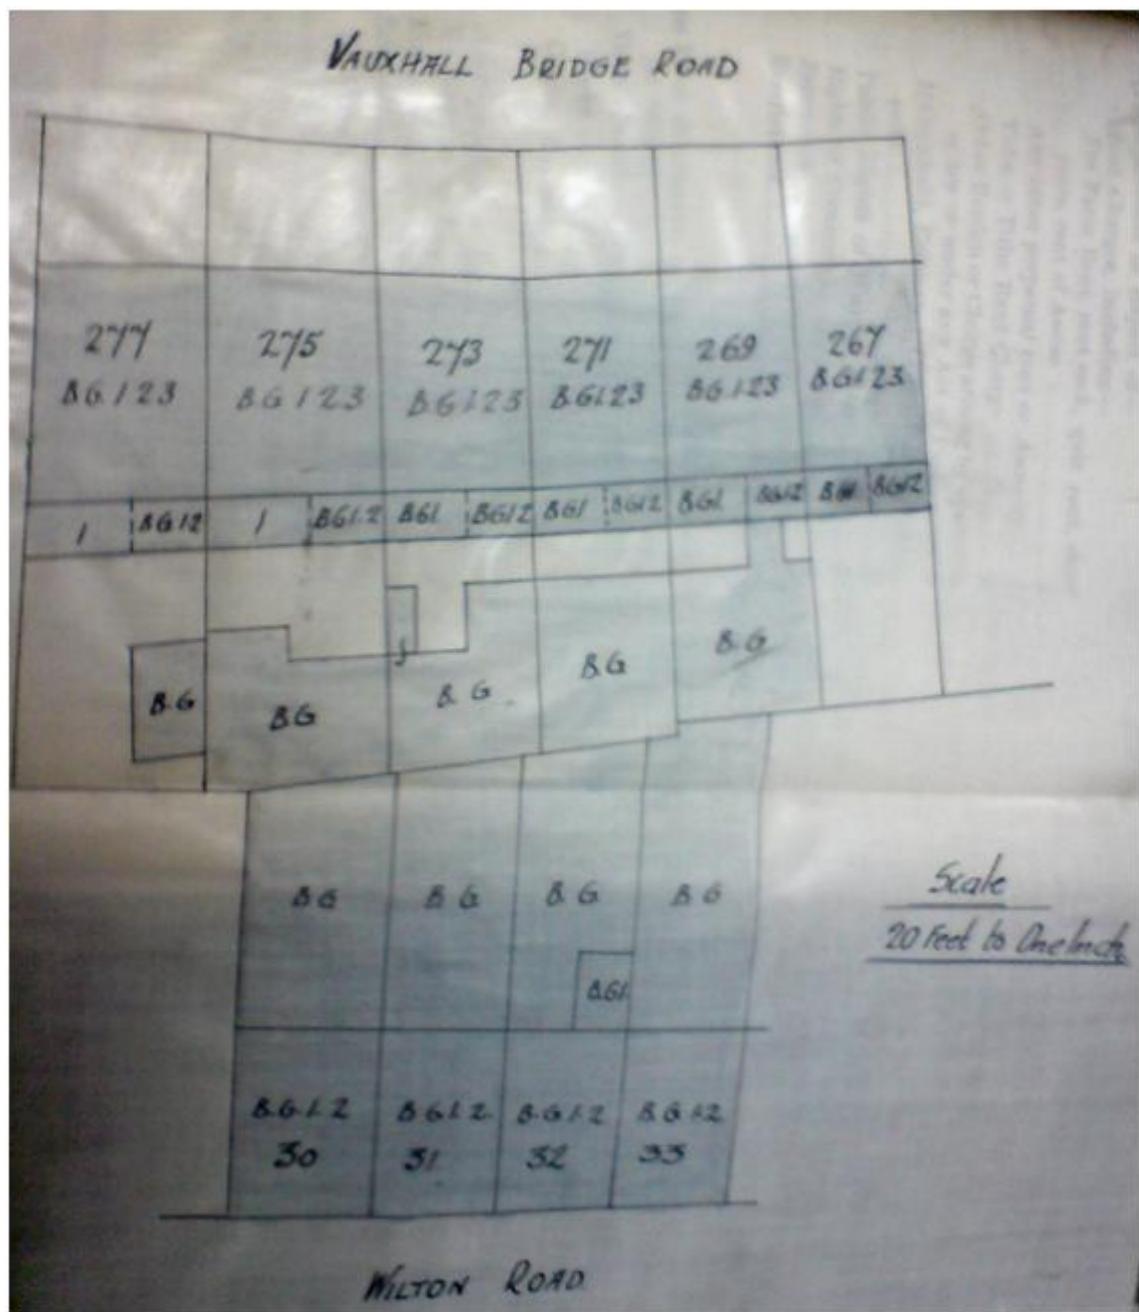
Wilton Hotel plan. The plan shows the configuration of houses joined together to form the hotel. The number of floors for each building are indicated by the letters 'B', 'G', '1', '2' and '3' to denote 'basement', 'ground', 'first', 'second' and 'third'. It was an extremely complex array of buildings and perhaps this added to the police's anxieties towards the premises – the various buildings creating places to hide criminal activity perhaps.
